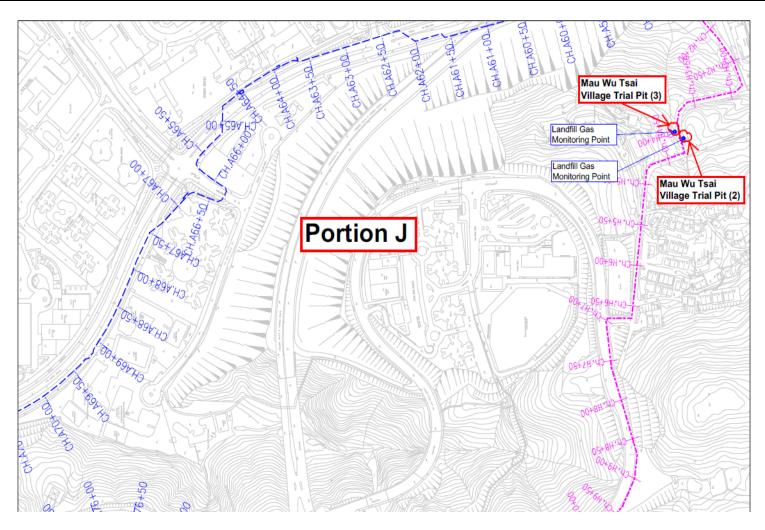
Location Plan for Portion J - Mau Wu Tsai 3 (Po Lam South Road 3)
